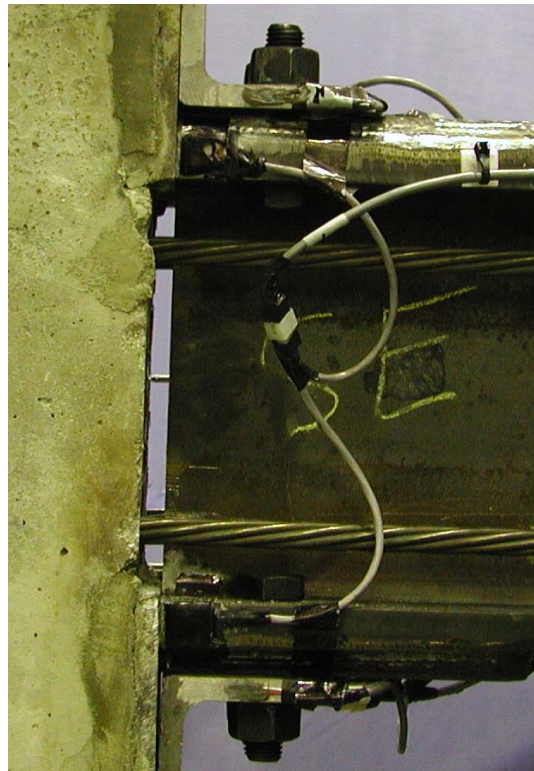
Photograph showing shim plates at beam-to-reaction-block interface
